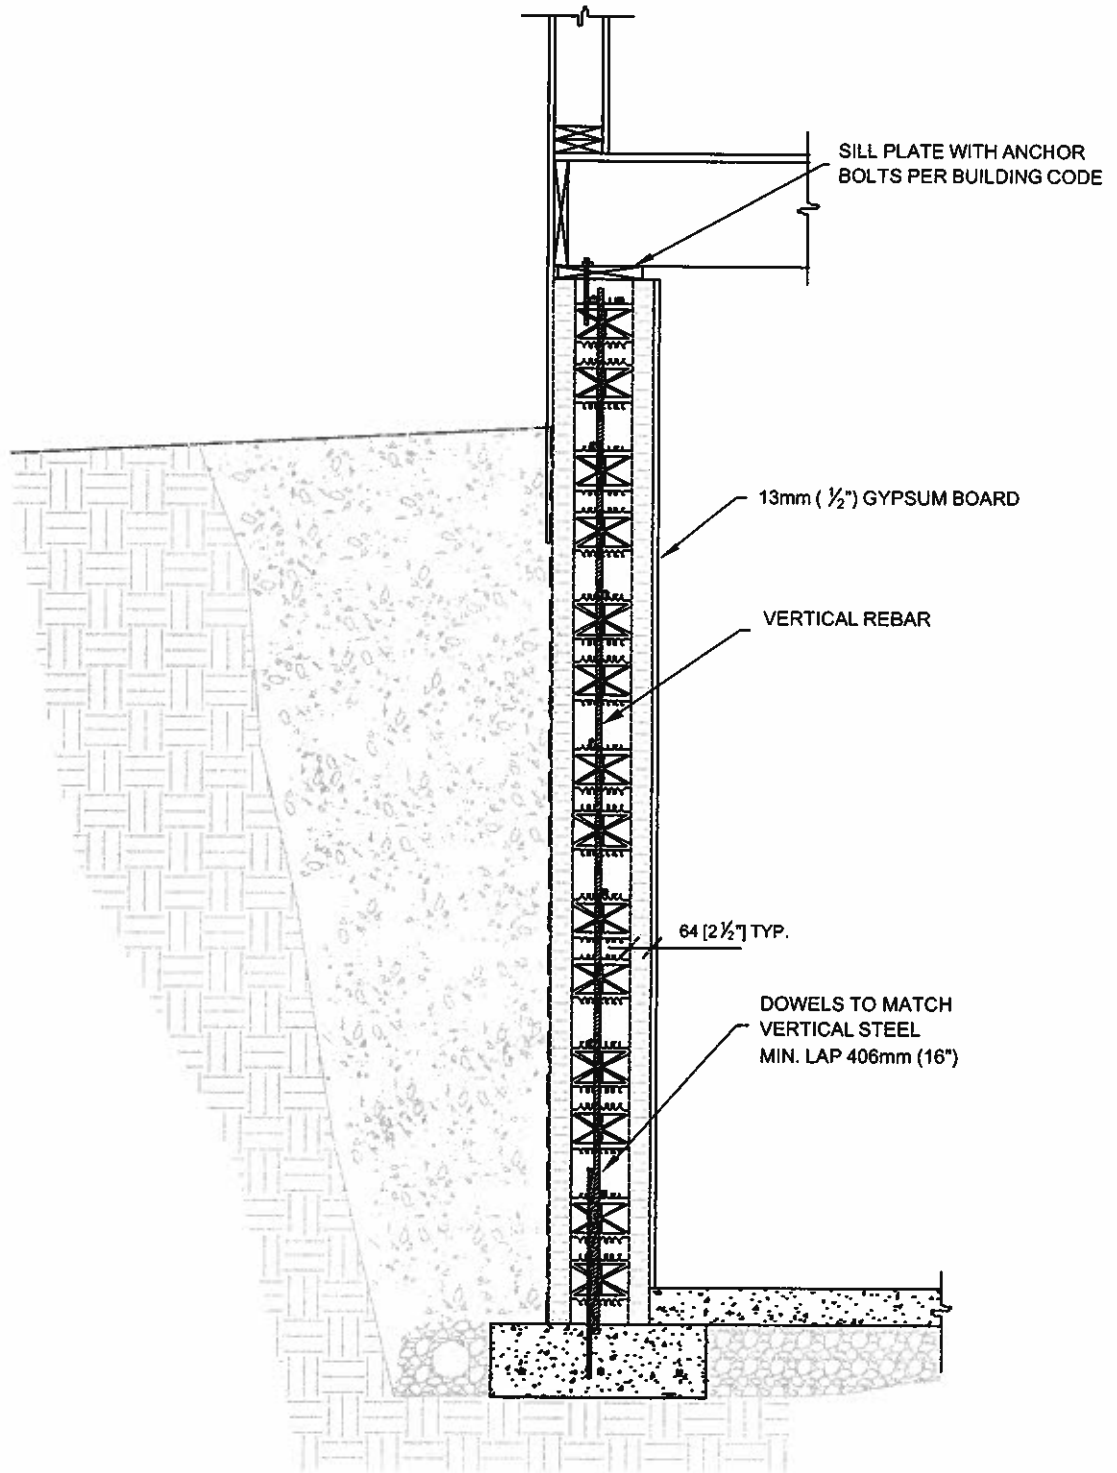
TYPICAL WALL SECTION, ADVANTAGE ICF SYSTEM, FOUNDATION AND WOOD STUD ABOVE GRADE
